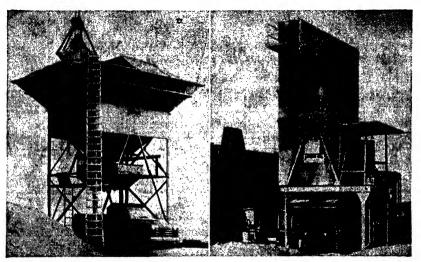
Roadbuilders' batching plant. (C. S. Johnson & Co.)
